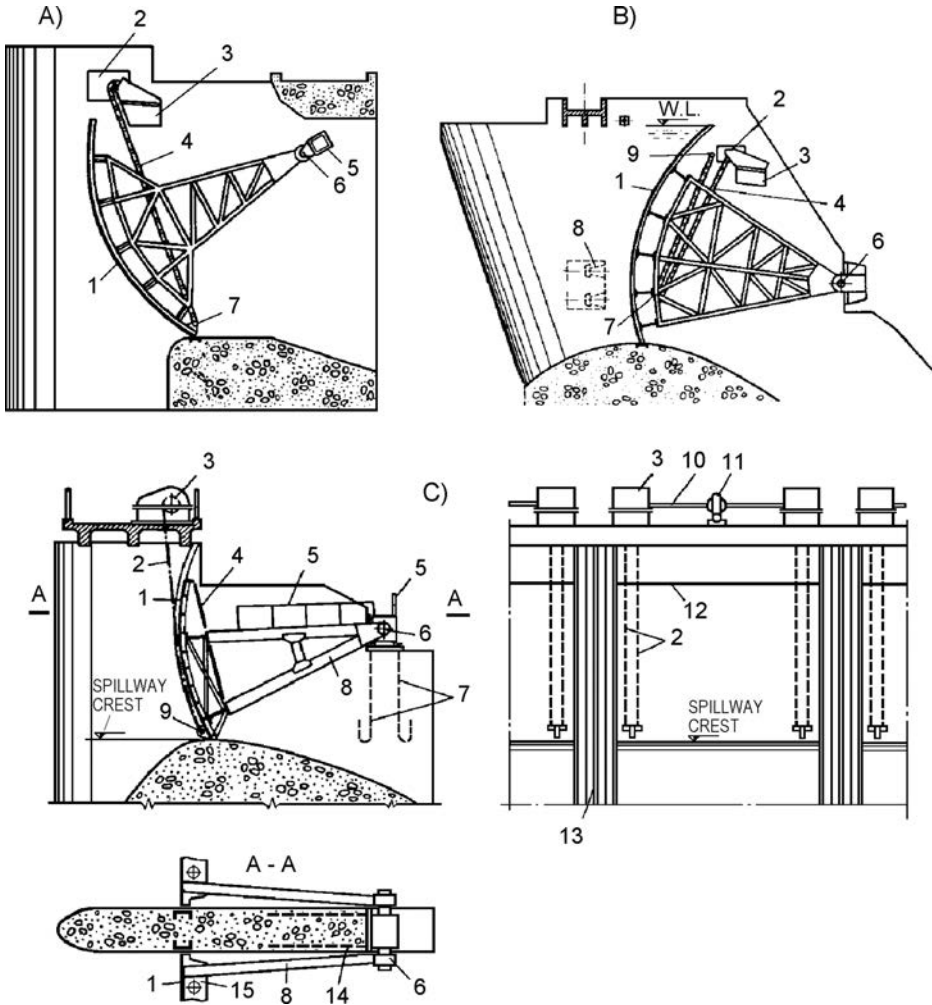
Constructional schemes of radial gates with inclined supporting legs. (A, B): (1) Waterproof lining; (2) place for fixing the lifting mechanism; (3) space for placing of the chain; (8) fixing of the anchoring reinforcement of the hinge; (9) fastening the chain into the side wall. (C): (1) Lining; (2) chain or thick rope; (3) hoist; (4) downstream lining; (5) fence; (6) hinge; (7) anchors of the hinge; (8) supporting leg; (9) fixing of the rope; (10) shaft; (11) engine; (12) crest of gate; (13) deformation joint in the side wall; (14) horizontal anchors of the hinge; (15) bar (beam).
